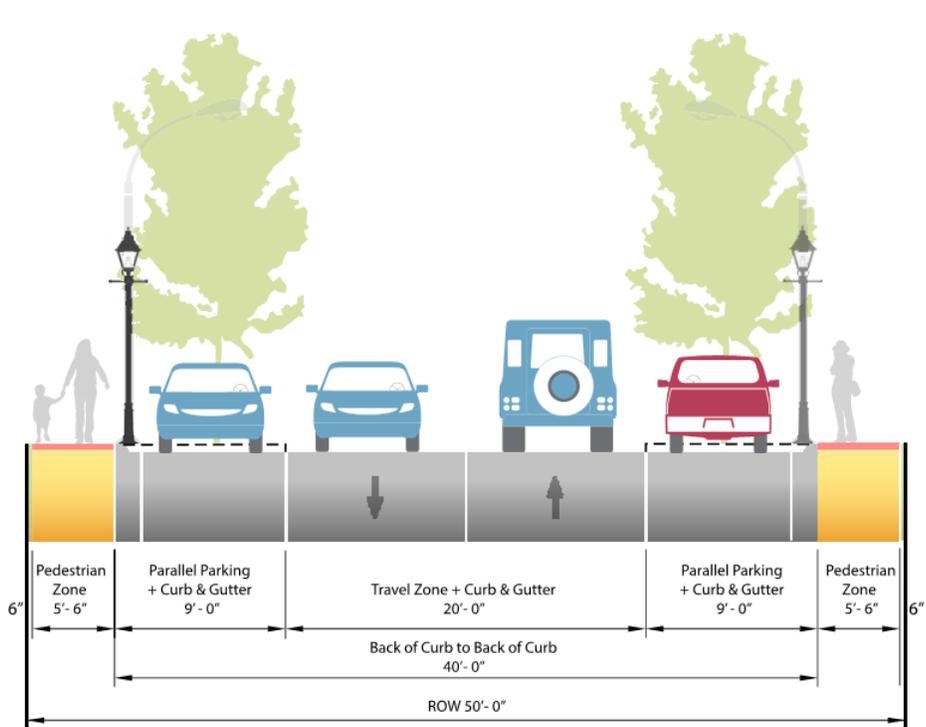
Proposed Alternate North Alexander St Complete Streets Cross Section with Parallel Parking (North of East Ascension Street)
